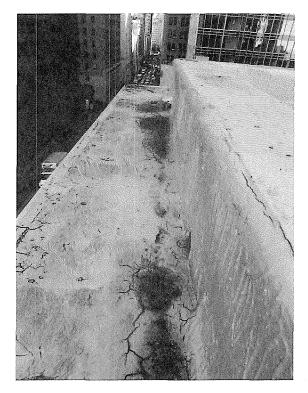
Detail view of parapet and top of cornice. Through-wall scuppers at the northern and eastern parapet walls drain the cornice back to the roof (photograph taken on 02/27/2018).
